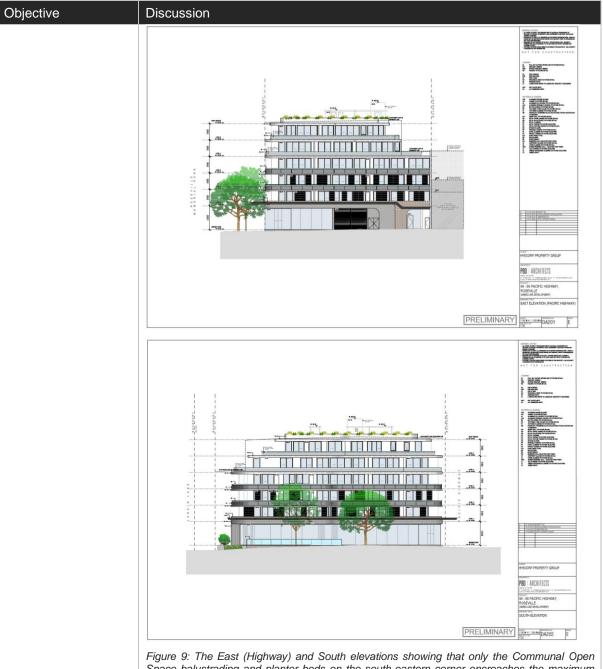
The East (Highway) and South elevations showing that only the Communal Open Space balustrading and planter beds on the south-eastern corner encroaches the maximum height limit. (Source: PBD Architects)
